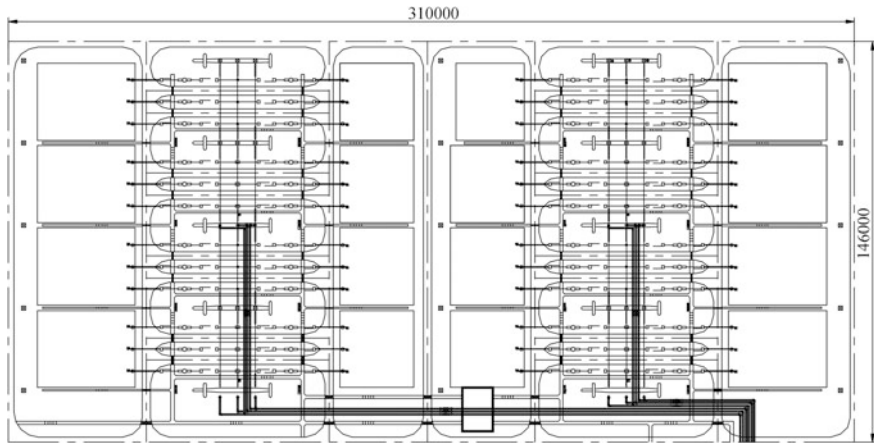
Typical checkerboard-pattern layout plan (mm)
